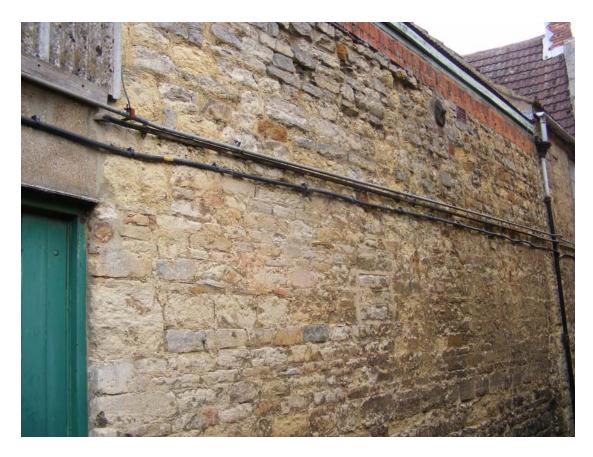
Possible blocking in west wall of G5, viewed from The Slabs
